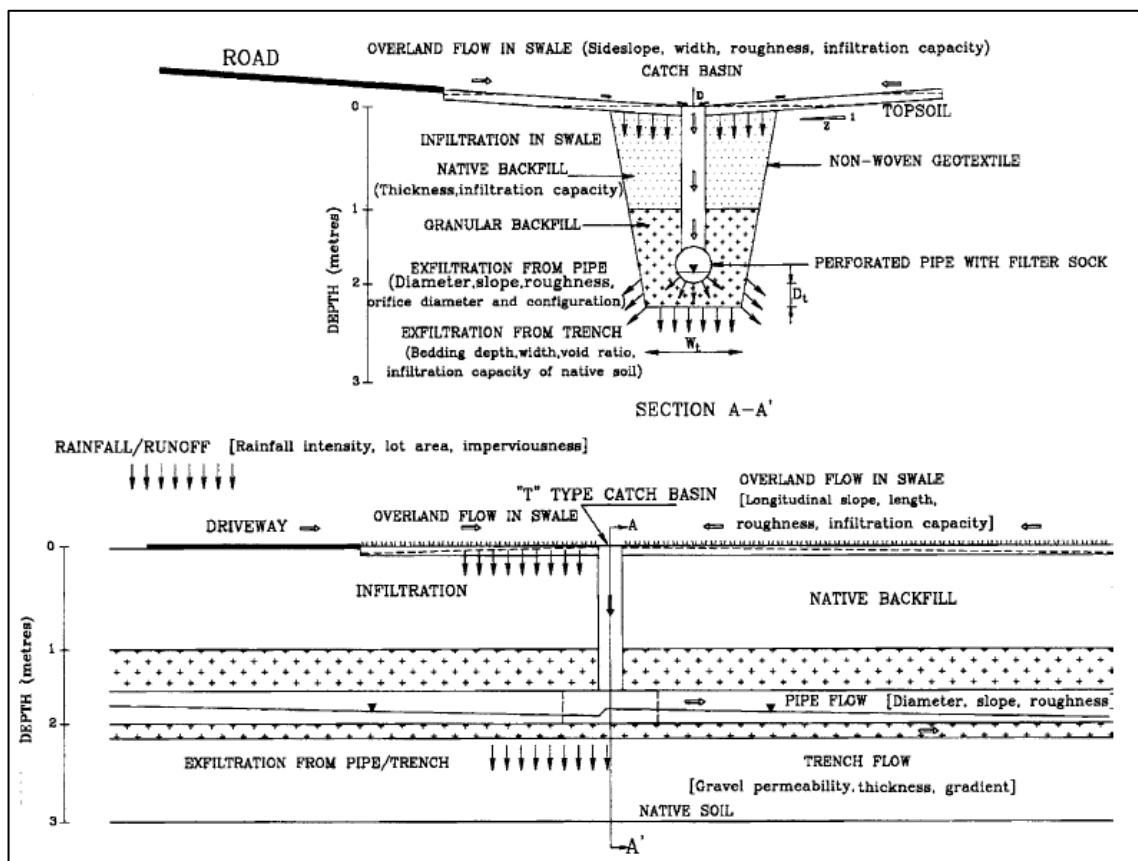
Schematic of Grass Swale-perforated Pipe Drainage System
